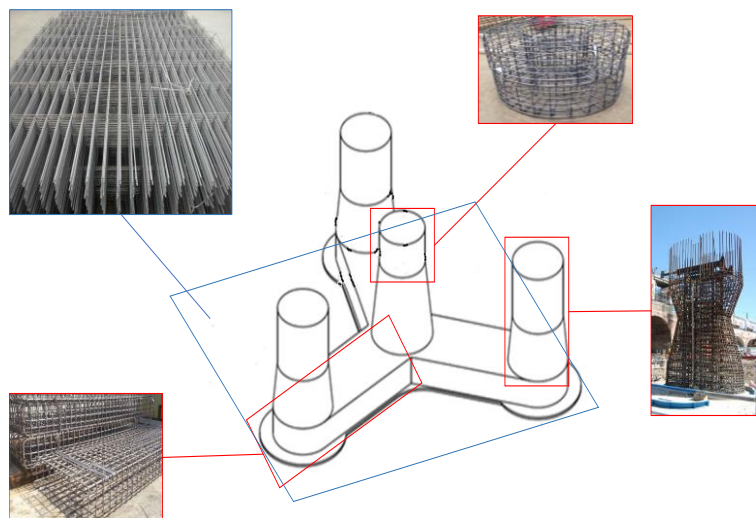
Exemplary subdivision of the floater design into prefabricated steel rebar elements [modified from Dr. Techn. Olav Olsen].
